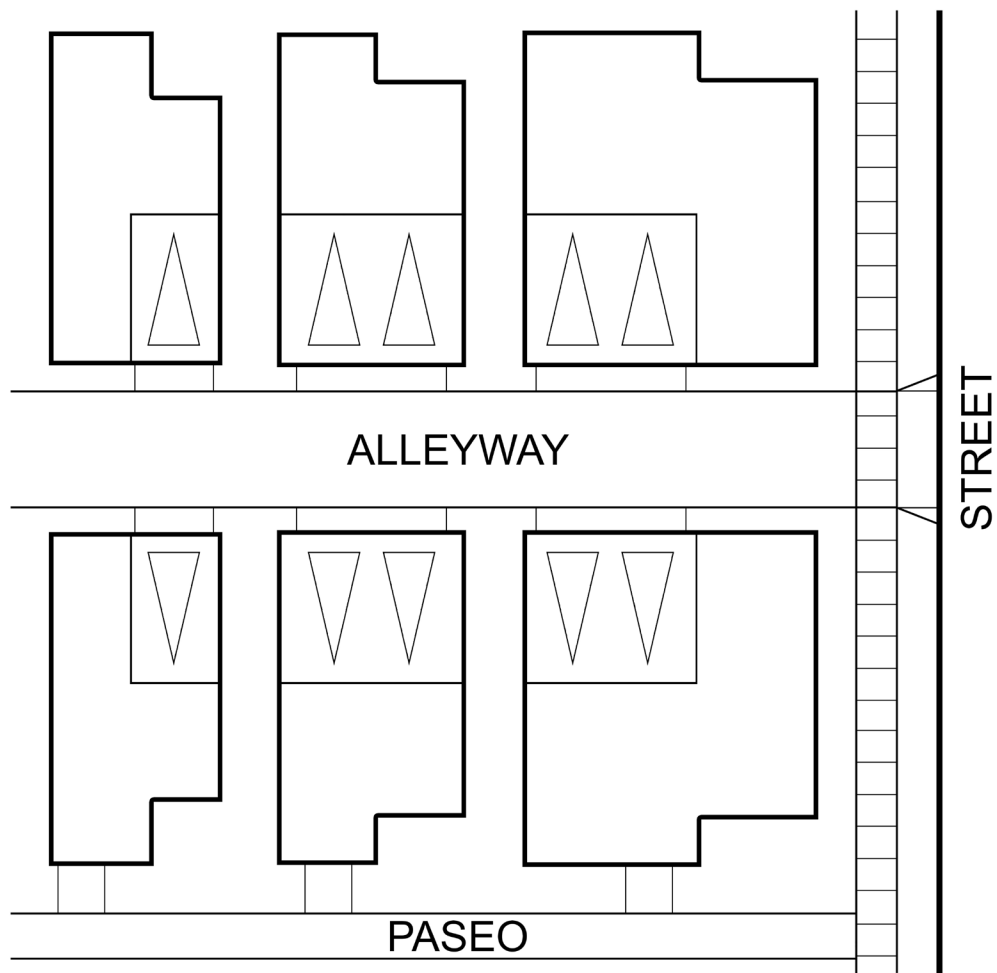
Conceptual Building Type F - Cluster Alley Loaded
